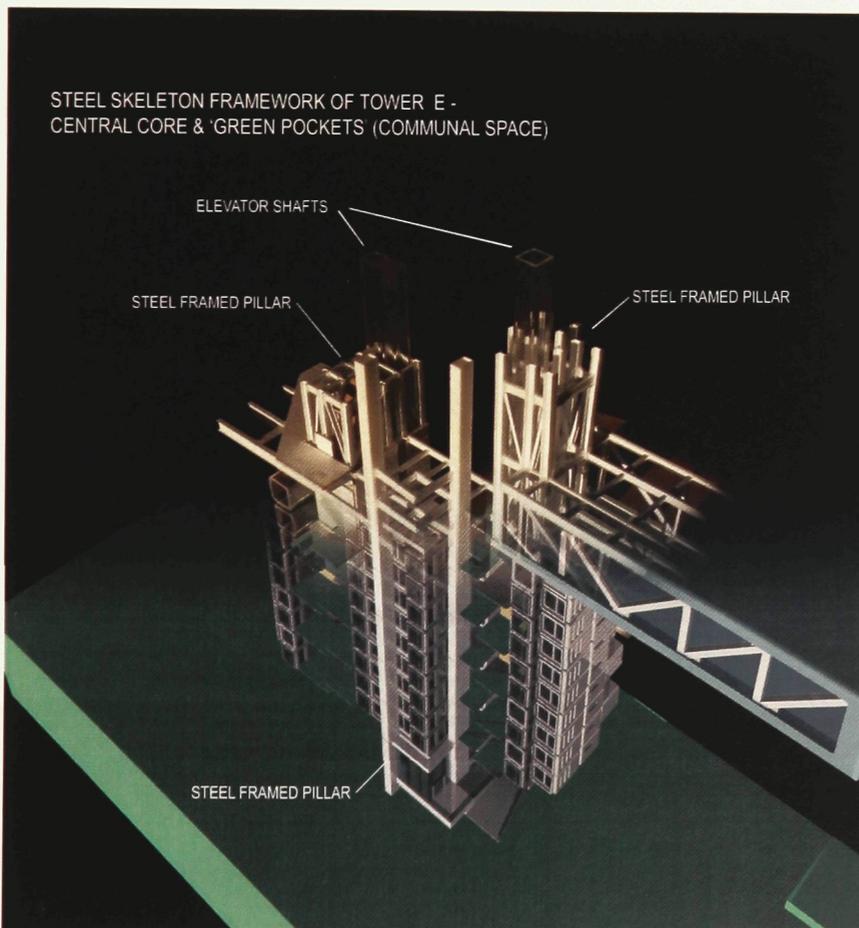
The structural layout is formed with three giant pillars that are joined with girders for every two storeys.
